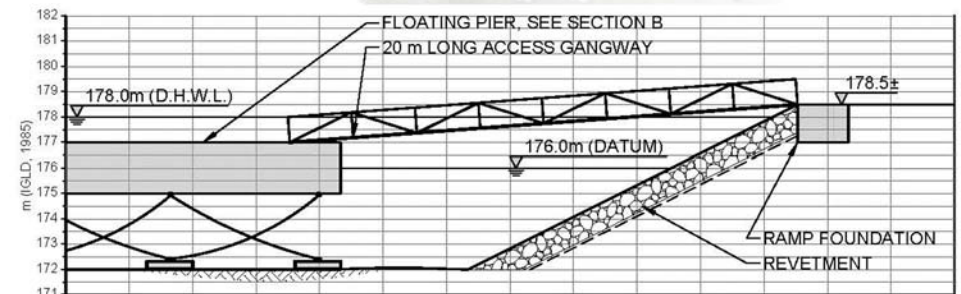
Typical Access Ramp for Floating Pier Cross Section
